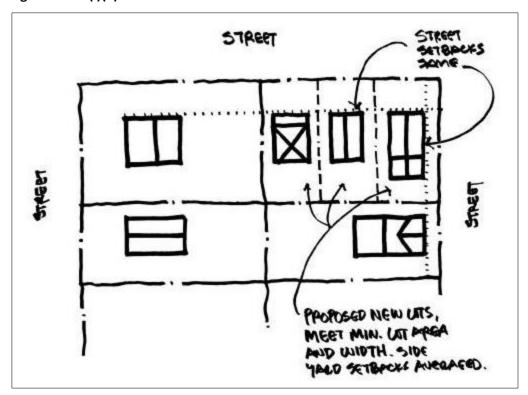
(I)(3)c: Setbacks on Vacant Corner Lot Subdivision
